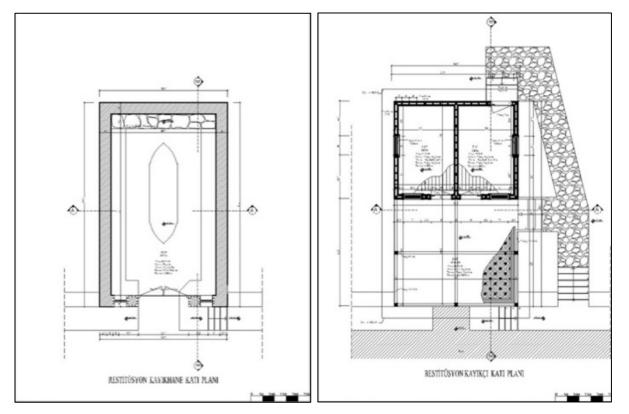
Restitution Plans of the Basement and Ground Floors (Tanriverdi, 2011)
